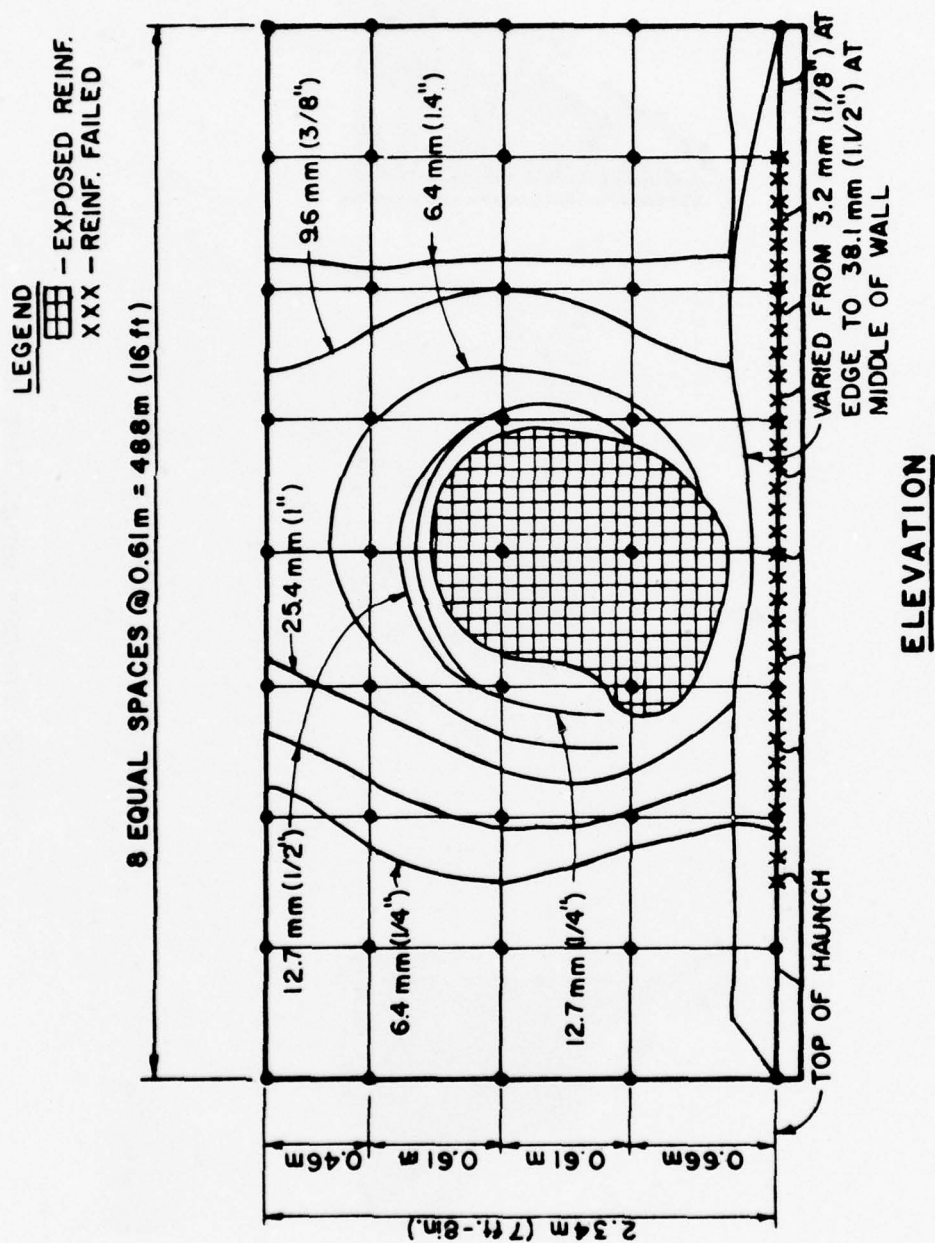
Crack patterns, Wall No. 1, Test No. 3
